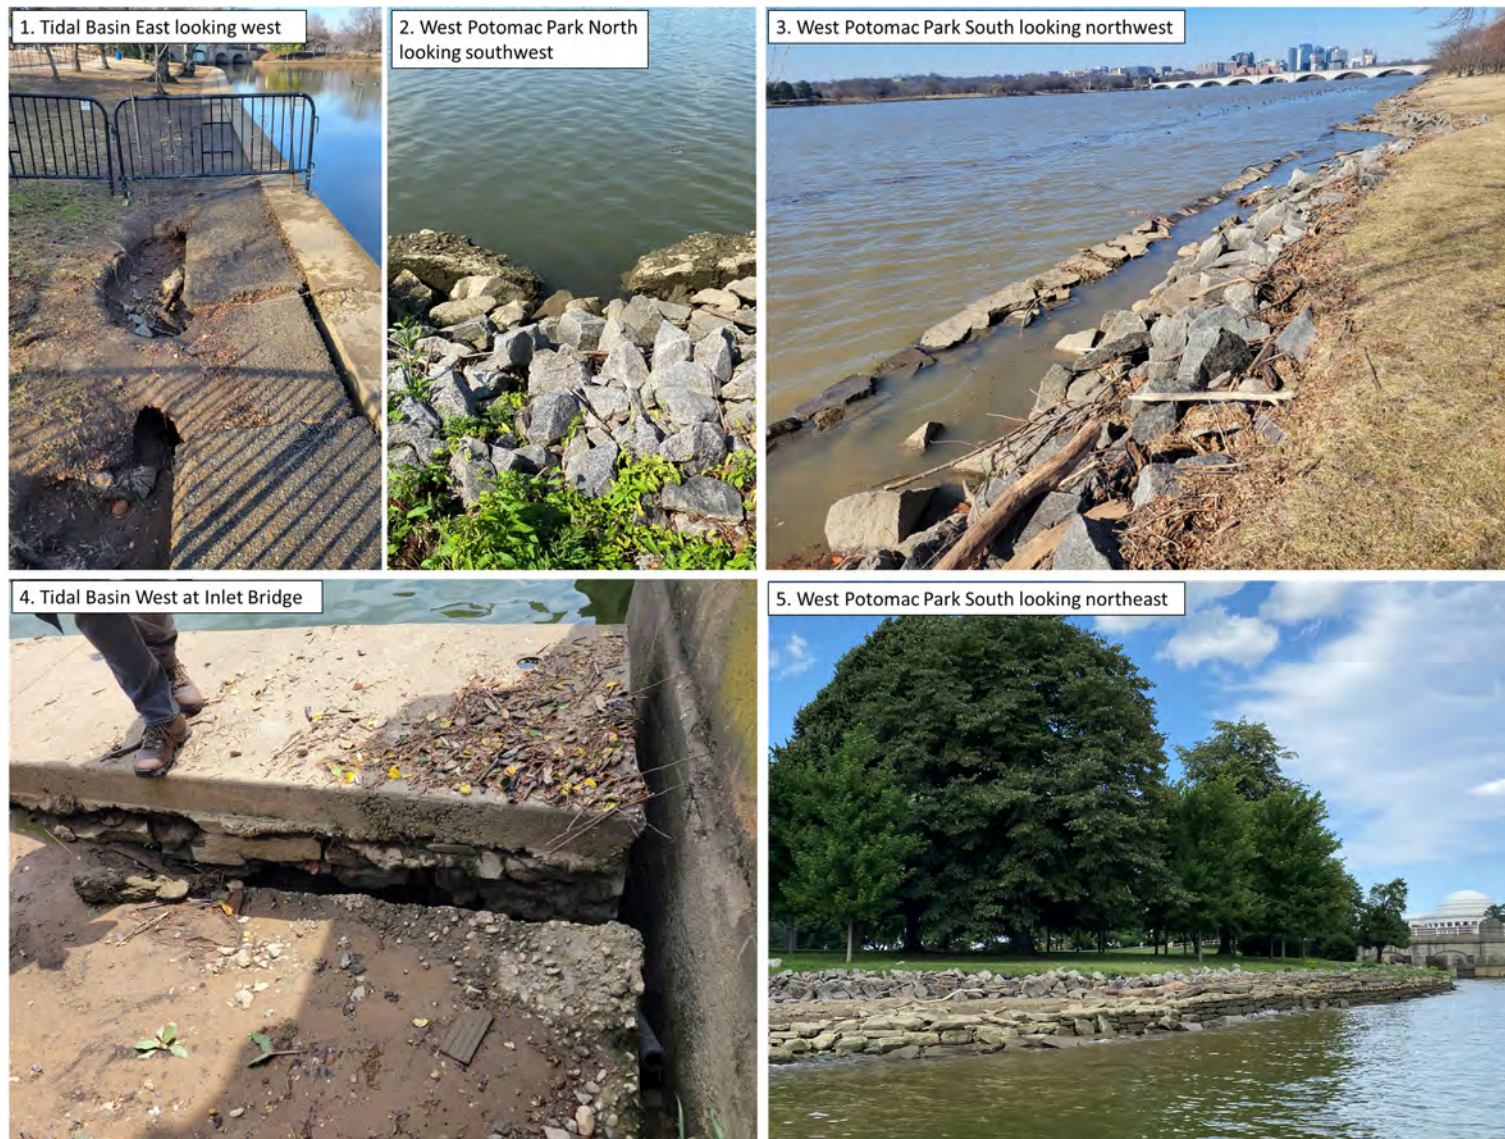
EXAMPLES OF EXISTING DAMAGE TO SEAWALL (PHOTOS TAKEN IN SPRING 2022): 1-ASPHALT DAMAGE, 2-CONCRETE CAP DAMAGE, 3-UNEVEN TOP OF WALL, 4-TOP OF WALL SEPARATION FROM UPLANDS, 5-DISLODGING OF SEAWALL STONES.
